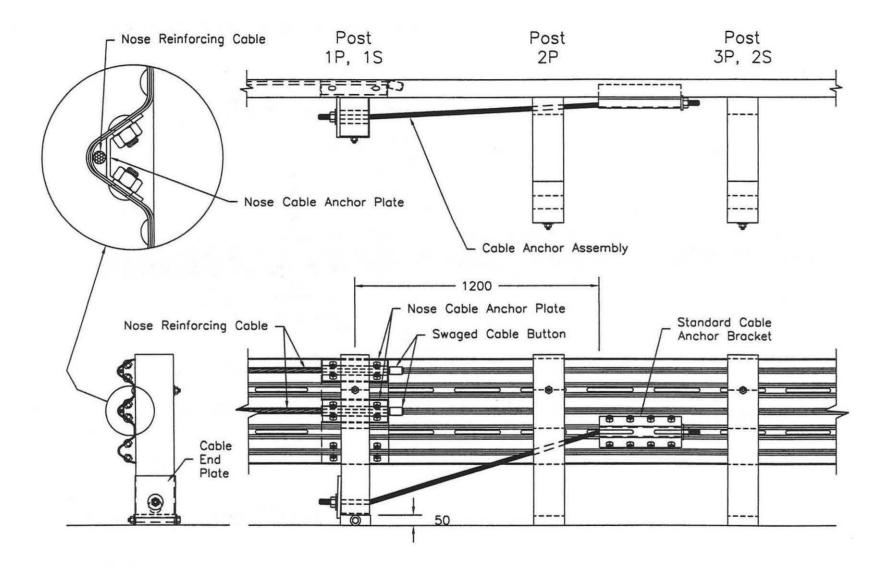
Cable Assembly Detail, Simplified Short-Radius Guardrail System
